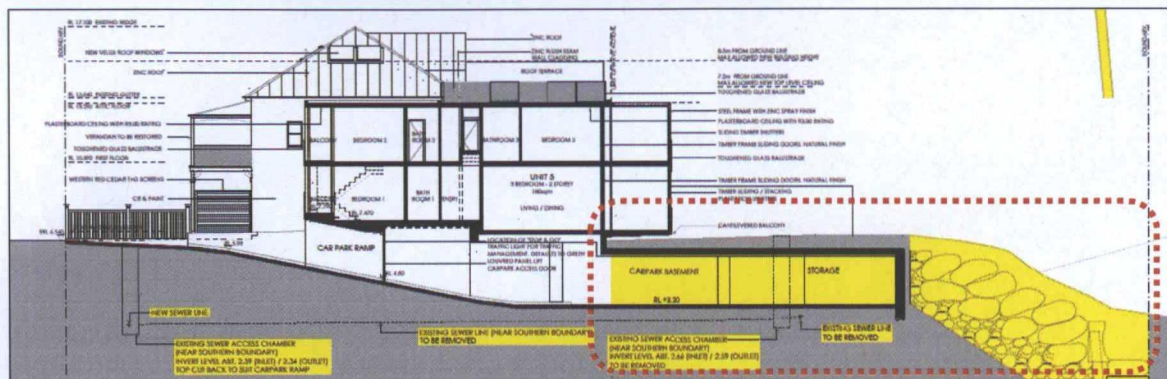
PROPOSED SECTION PLAN SHOWING RELOCATED PARKING AND SEAWALL
